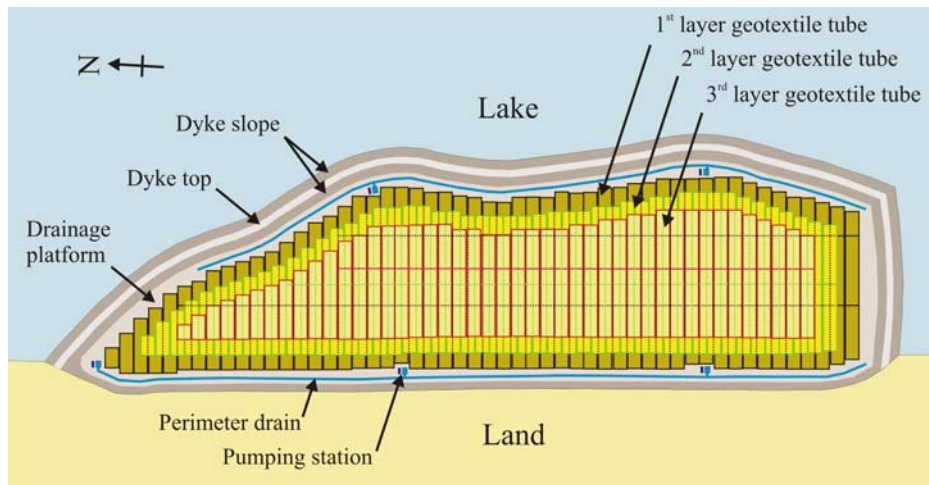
Superimposed layout of the three layers of geotextile tube filled with dewatered sludge.
